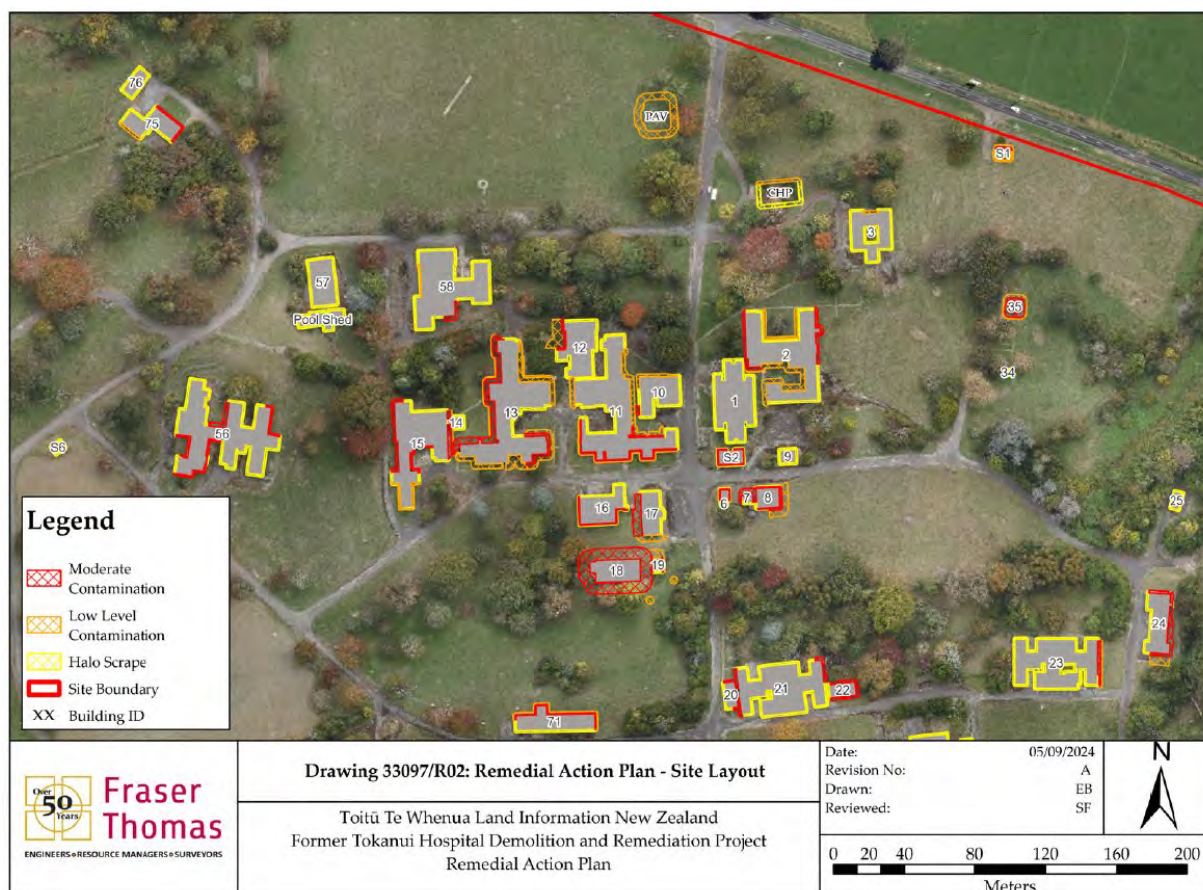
Remedial Action Plan – Site Layout (2 of 3)
